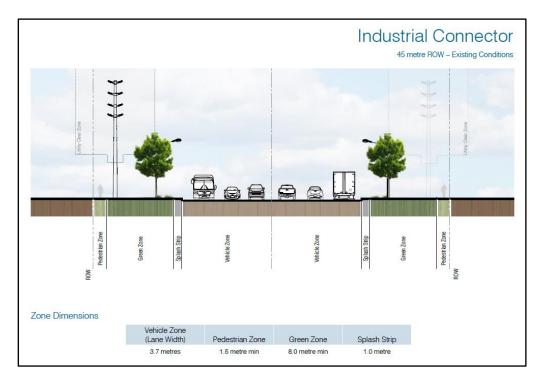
Illustrative Roadway Cross Section for Industrial Connector (Source: Region of Peel Road Characterization Study, Section 2: Illustrative Cross Sections, May 2013)
